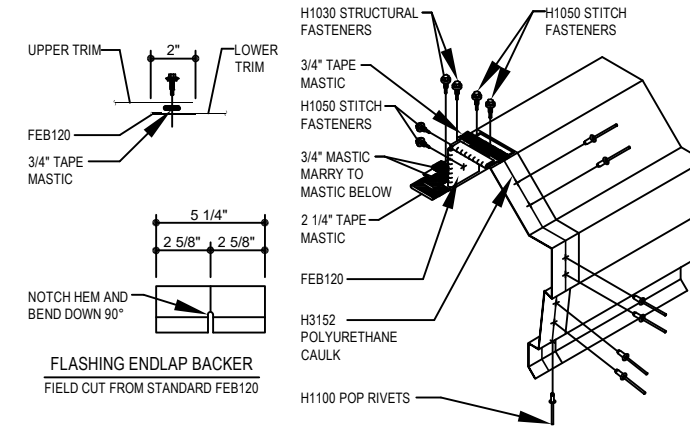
DETAIL SHOWN WITH WALL PANEL AND CORNER TRIM. MASONRY AND INSULATED WALL PANEL CONDITIONS SIMILAR.
